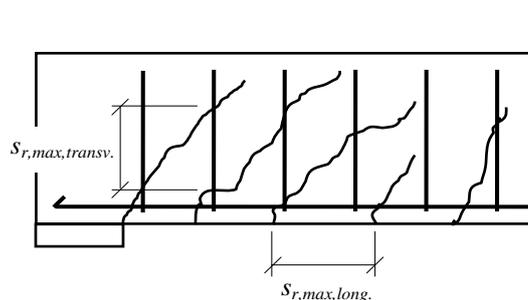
It can be discussed whether it is the longitudinal or the transversal reinforcement that determines the width of shear and torsion cracks.
